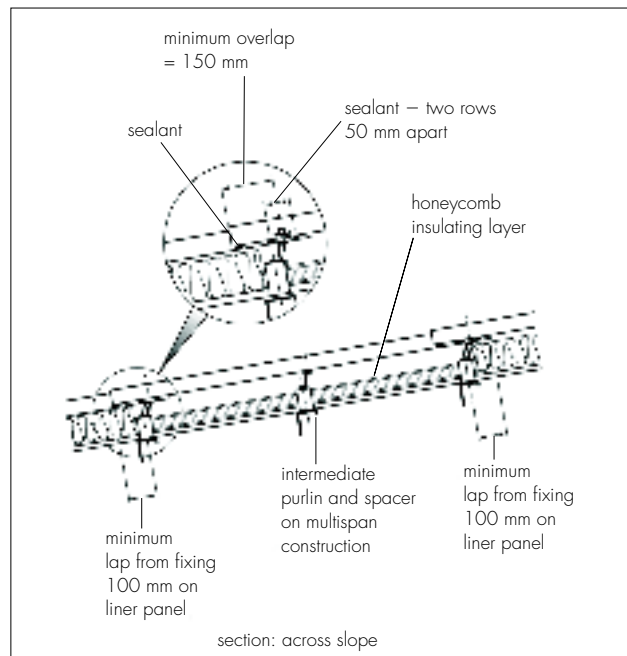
Fixing detail for site-assembled rooflights — side laps, underlap/overlap
